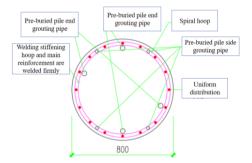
Installation position of pile end grouting pipe(37.1m, 38.1m pile type).
